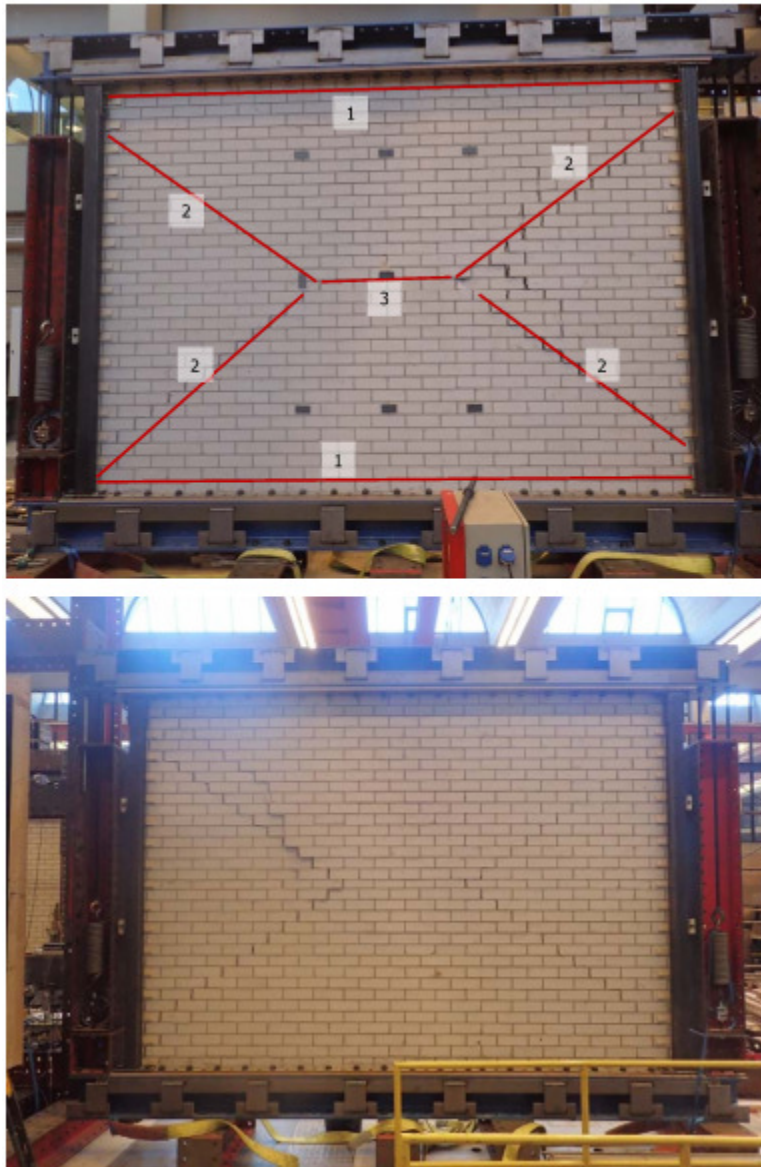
TUD-COMP-11: Final crack pattern of front side (top) and back side (bottom)
